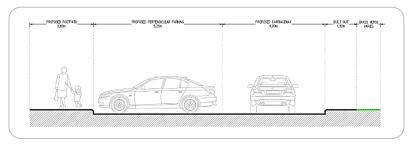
Typical one-way local street cross section (Stapolin Avenue)
